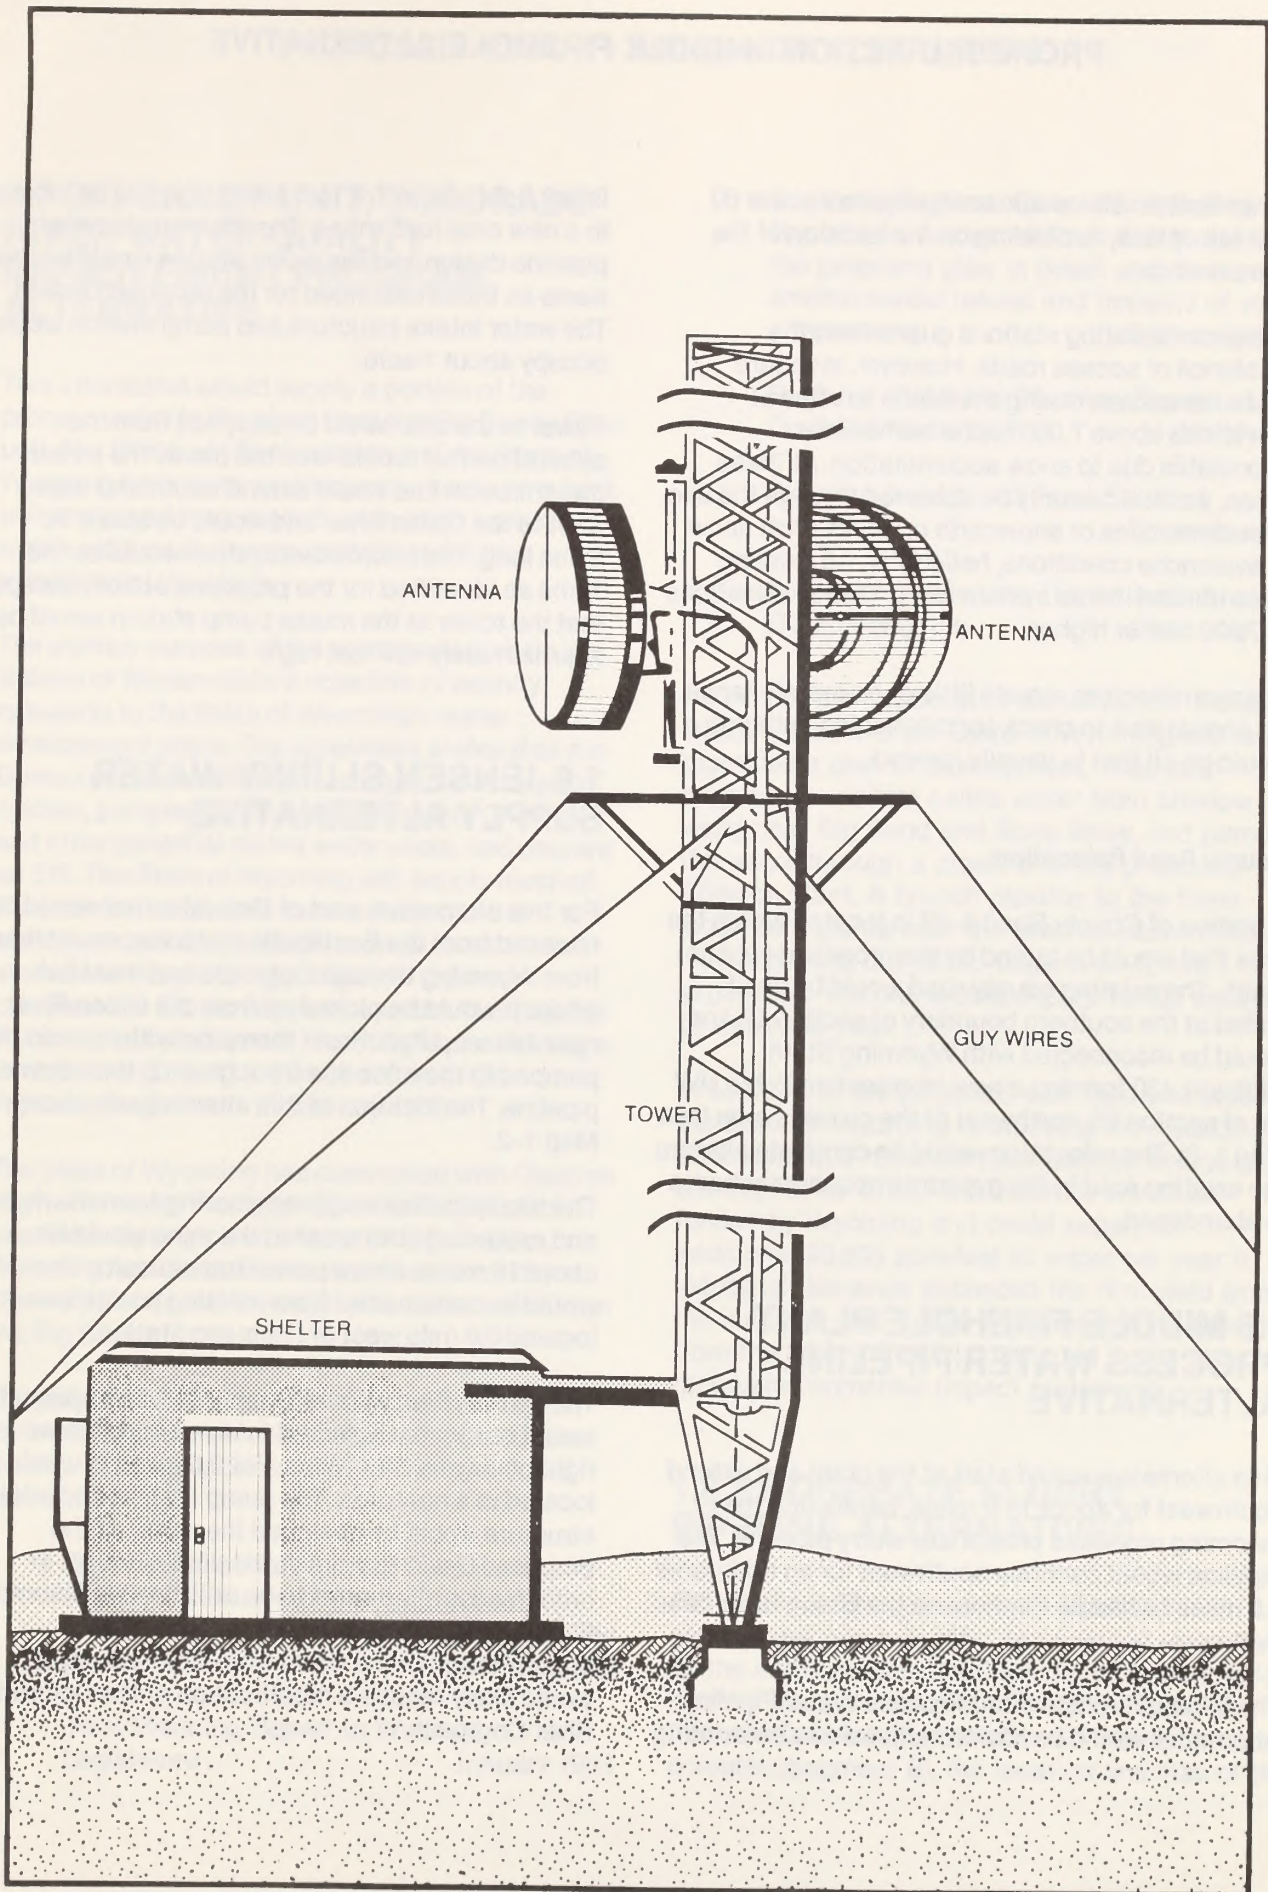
TYPICAL MICROWAVE REPEATER SITE
